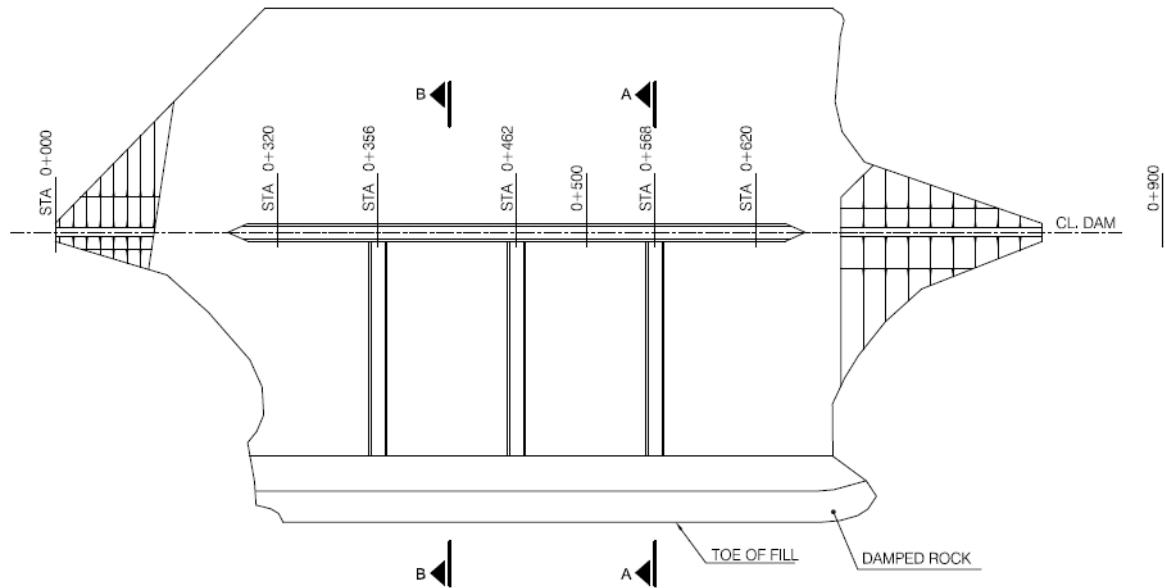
Doroodzan dam horizontal and vertical drainage locations
